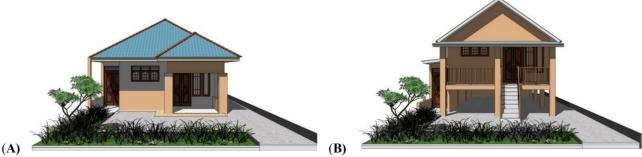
Drawings of existing facade plan (A) and the Stilt house concept (B) of Mr. Badri's house Source: Authors, 2023
